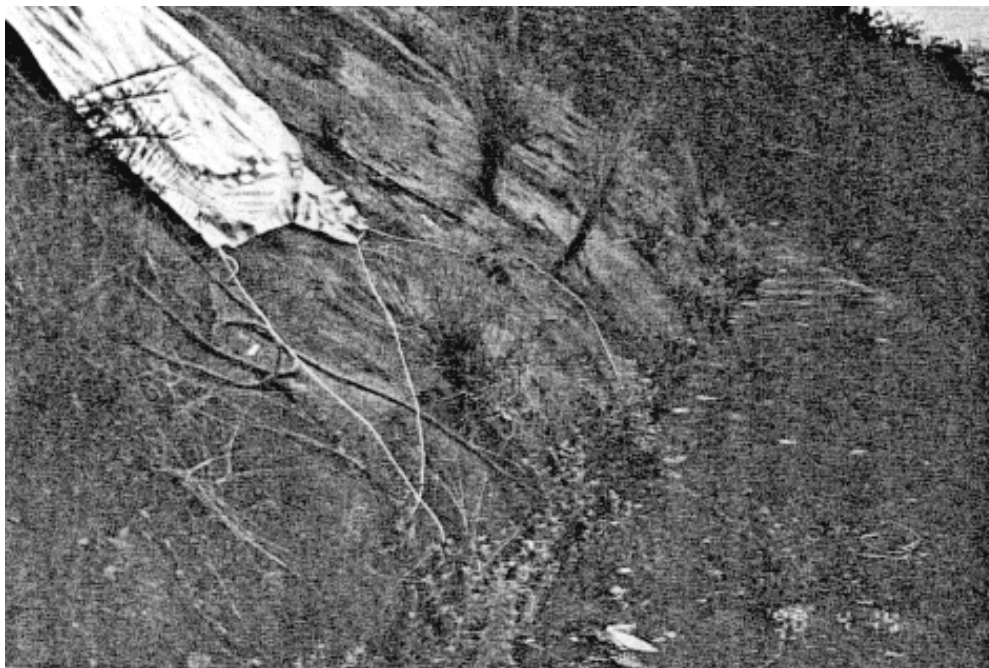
View South-east Along Upper Berm. Note Break in Slope Angle and Cracking Along Break (Photograph Taken on 14 April 1998)
